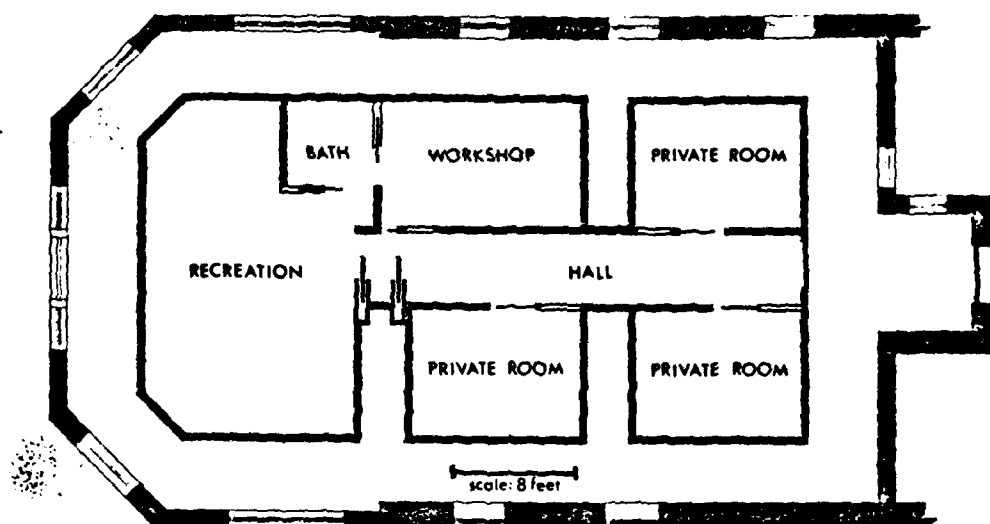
The floor plan of the laboratory, and its position within the surrounding building shell.
